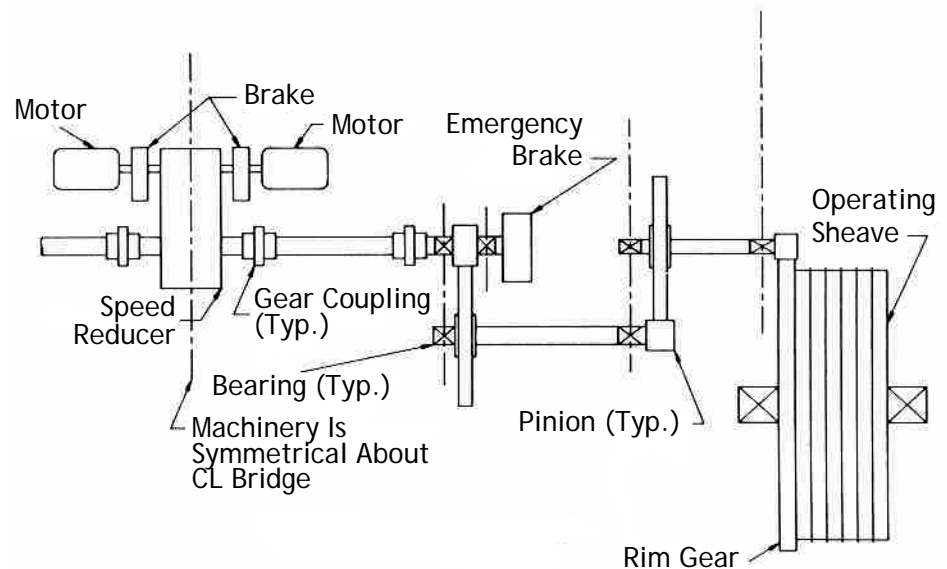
Vertical Lift Bridge Machinery is Located on the Towers, and the Rim Gears (and Operating Sheaves) are Rotated to Raise and Lower the Bridge
